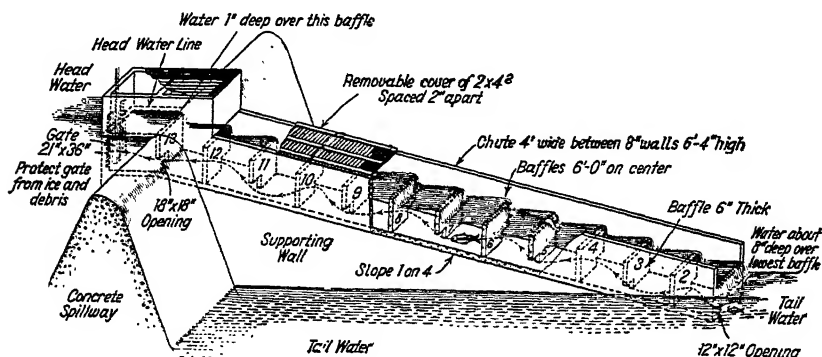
View of reinforced concrete fish chute. Reinforcing not shown. State of Michigan, Department of Conservation. Make openings through baffles increase in area uniformly between the lowest and highest opening.
